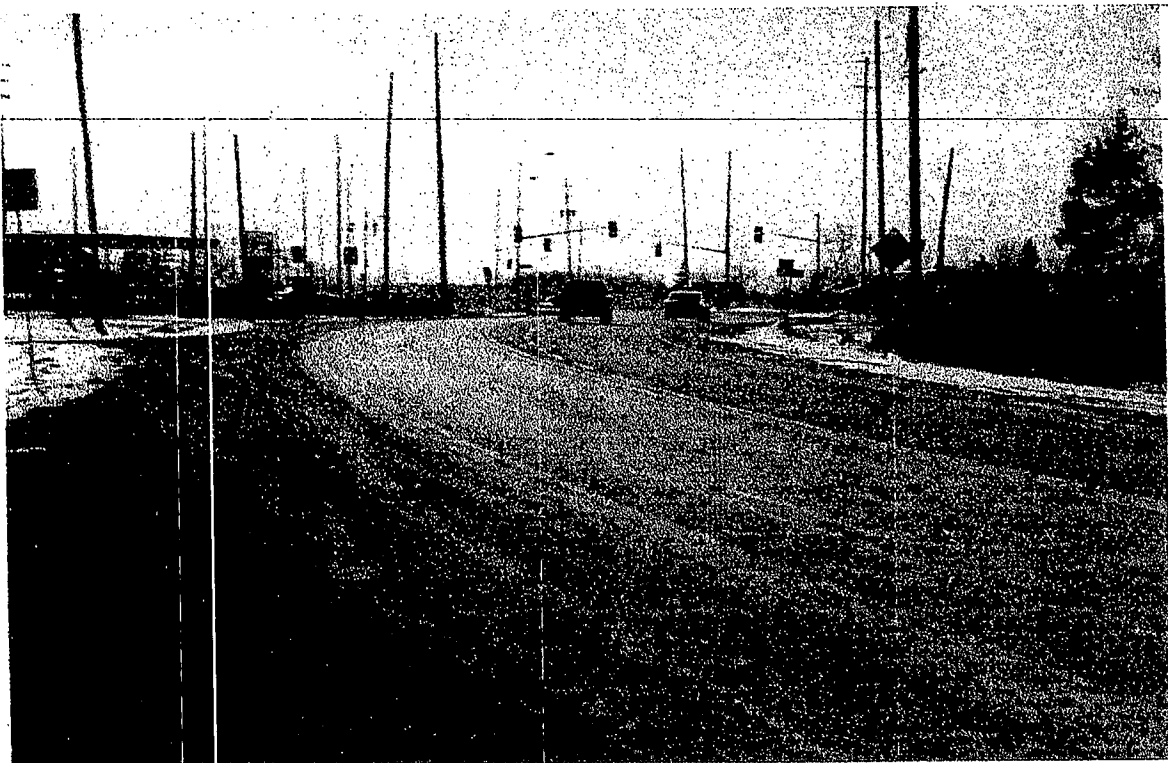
Looking north along Airport Road toward Mayfield Road.
